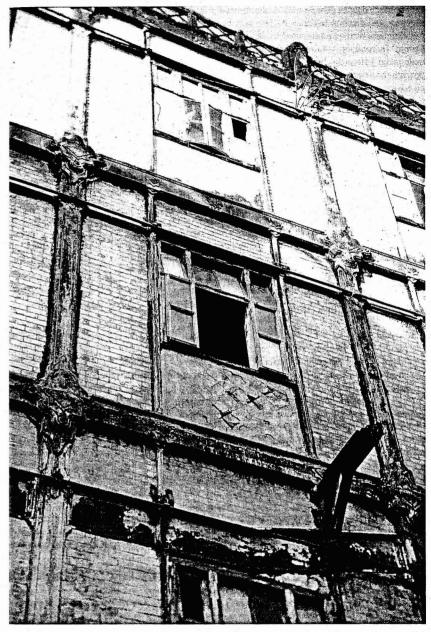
Secondary external frame system for carrying the windows (Jonathan Clarke).
